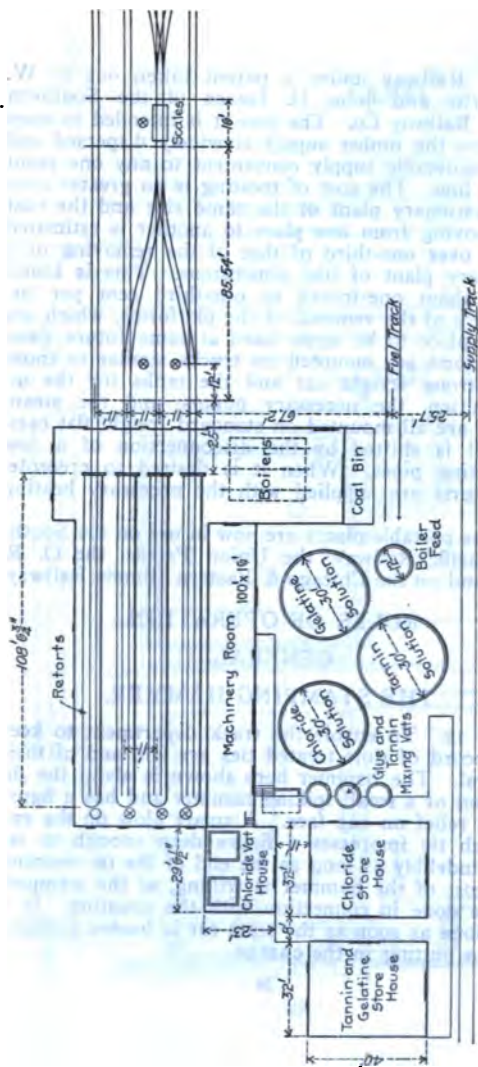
GENERAL LAYOUT OF BUILDINGS (G. N. RY.)
